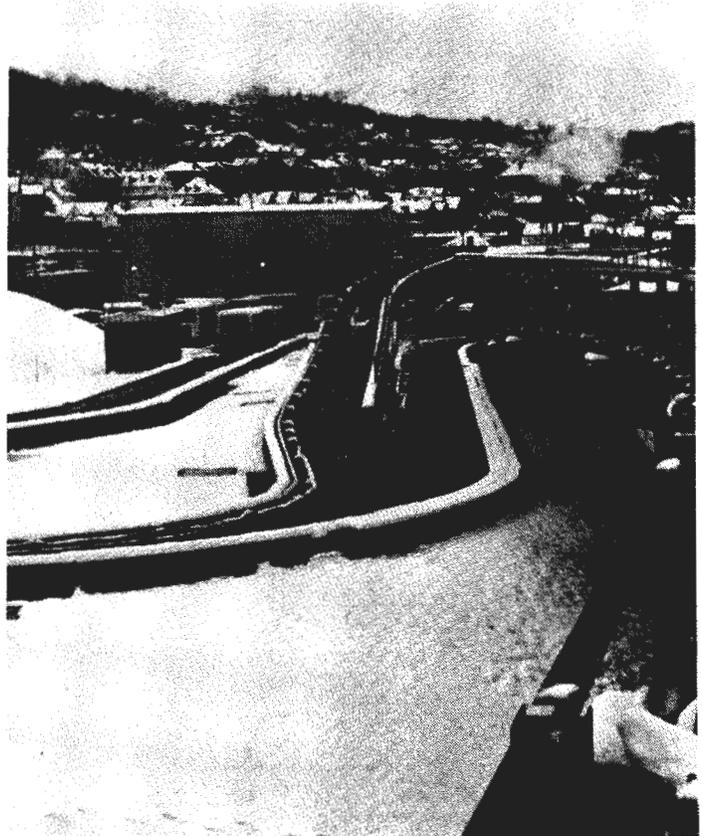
GUIDEWAY HEATING PIPES EMBEDDED ONLY IN RUNNING PADS OF ELEVATED GUIDEWAY
